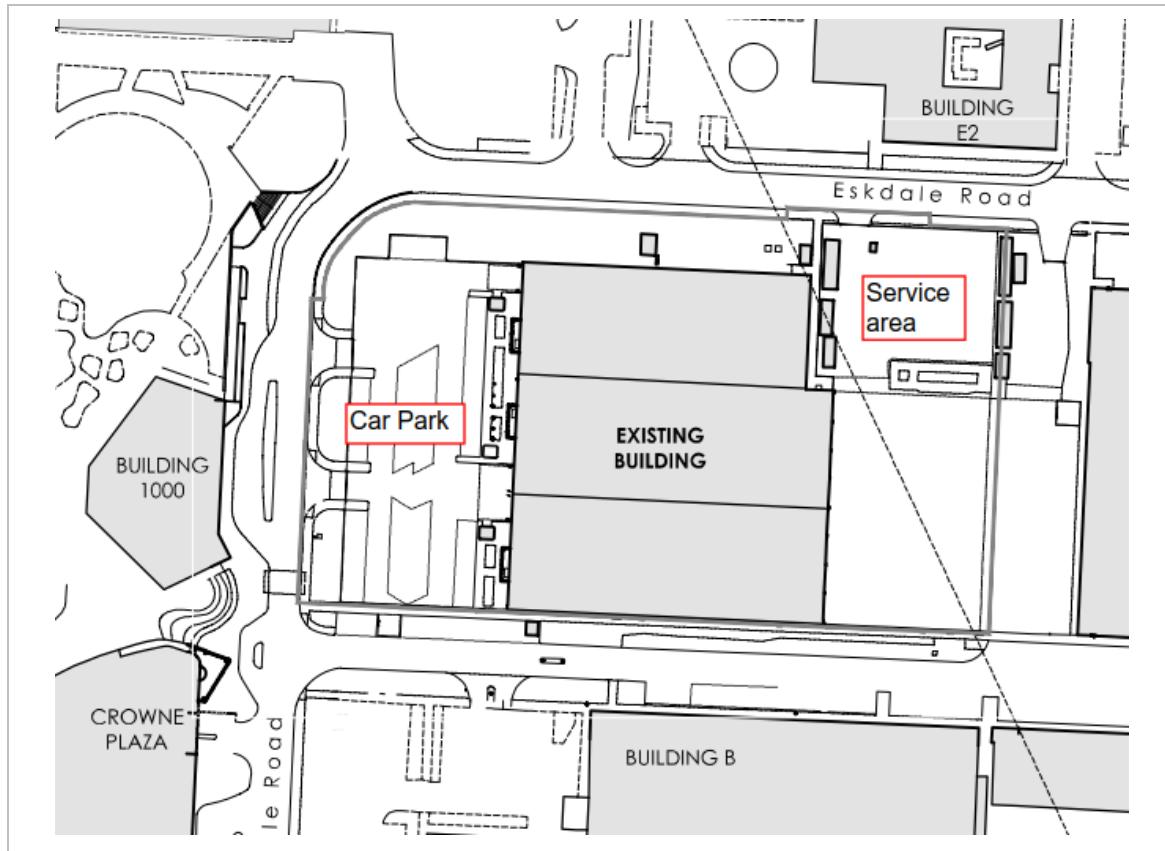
Winnersh Triangle – Existing Building 810 site arrangements
